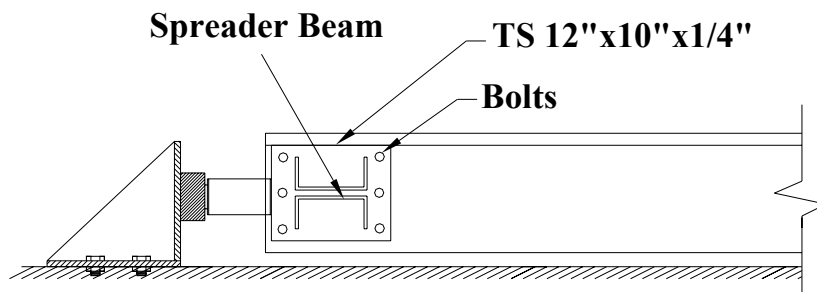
Plan View of Test Setup (2 Purlin w/o Lateral Restraint)
